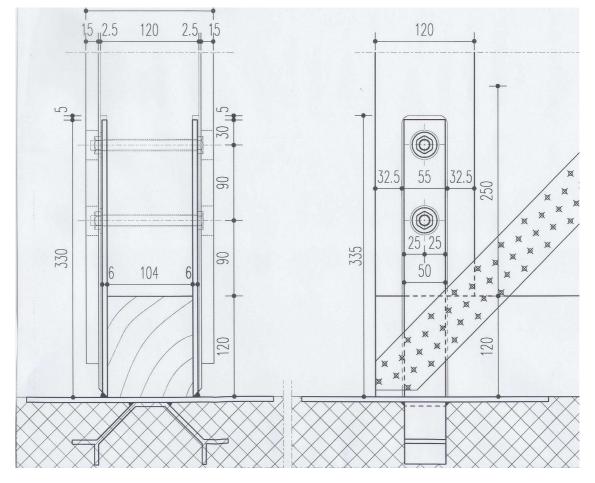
Connection of the wall element reinforced with BMF diagonal to the lower concrete wall.
